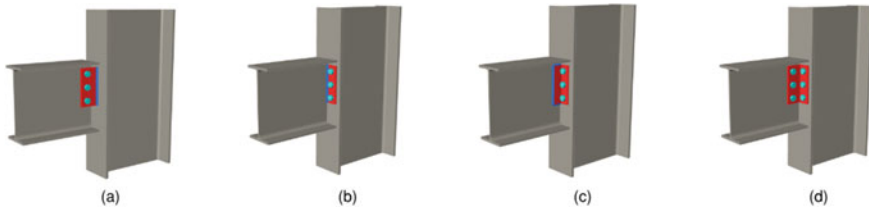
Simple shear connections: a Shear tab, b Shear end plate, c Welded–bolted angle connection, d Bolted angle connection
